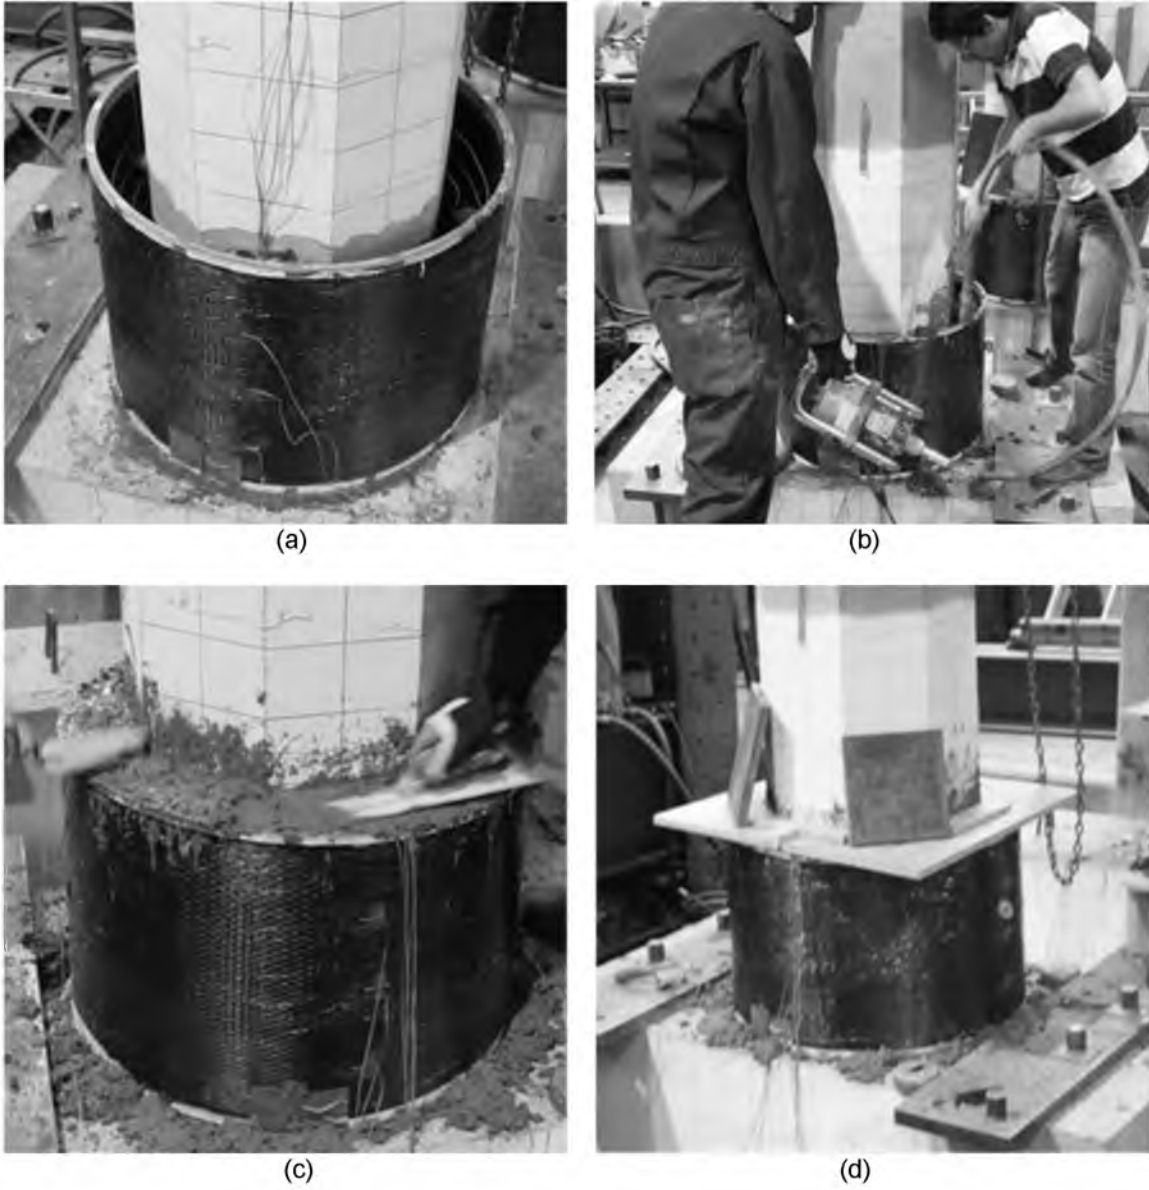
Repair concrete casting: (a) Before casting, (b) Vibrating concrete during casting, (c) Finishing concrete after casting, (d) Wooden formwork and weights in place after casting
